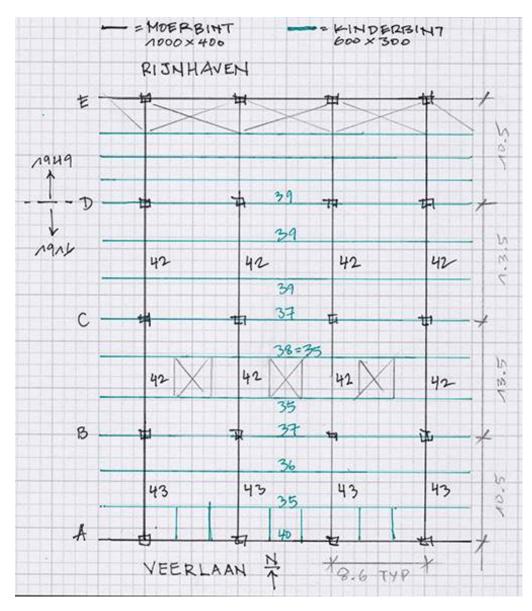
Excerpt plan of roof slab, hatched magenta on Fig. 5.16
